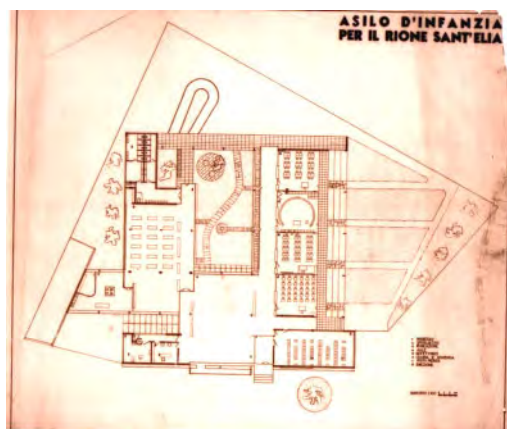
Asilo di infanzia per il Rione Sant'Elia', floorplan of raised level, (AT) 40/063/B1/D/L ca. 1937.
